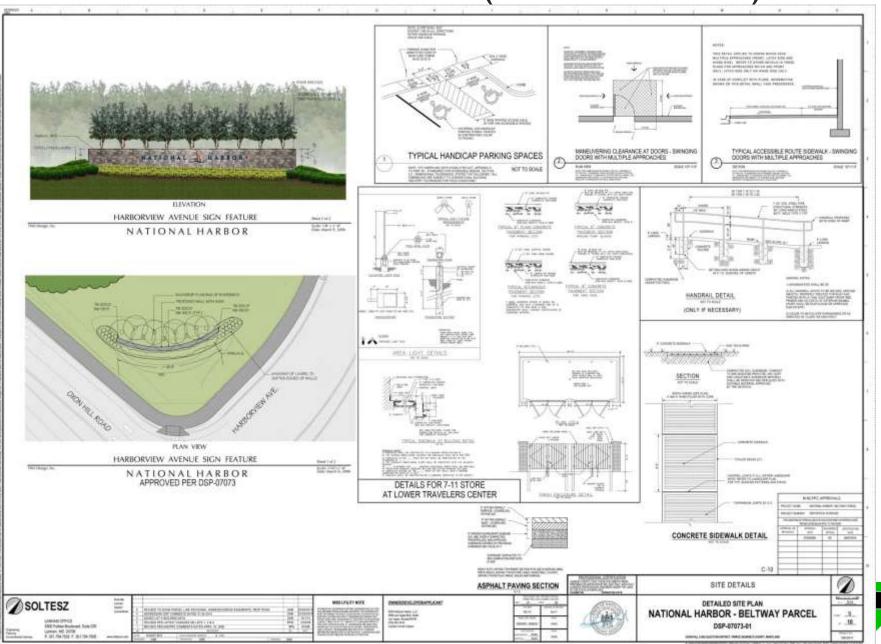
DETAILED SITE PLAN SET (PAGE 8 OF 10)
